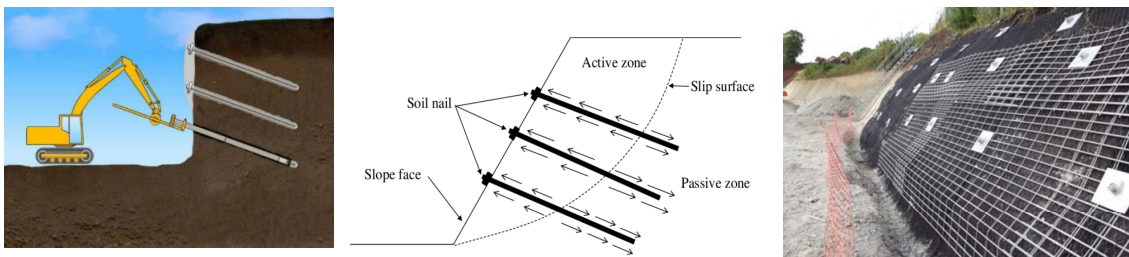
a) Soil nailing process, b) Soil nails in action, and c) Nailed Geosynthetic (under steel mesh)
